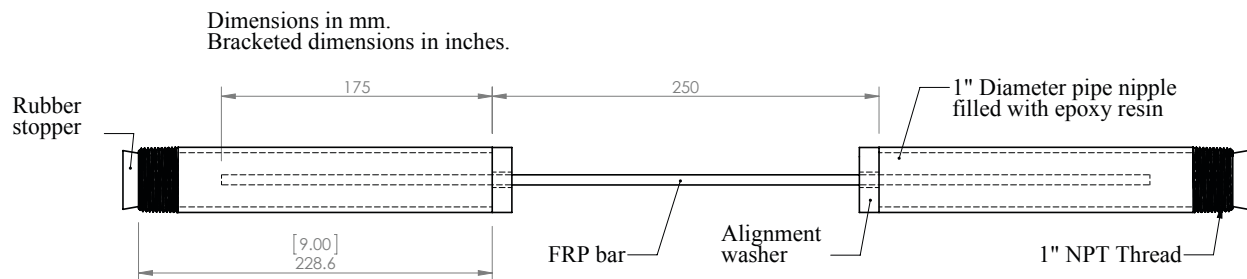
Schematic of potting setup for rebar tensile test specimens
